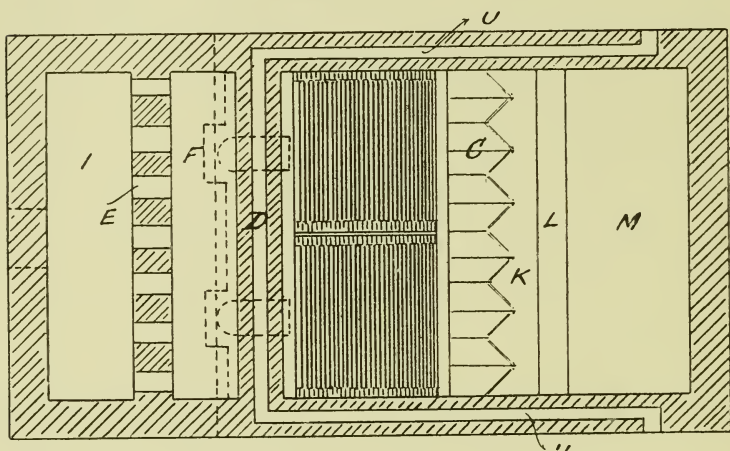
Plan of Beaman and Deas's Sludge Furnace.
